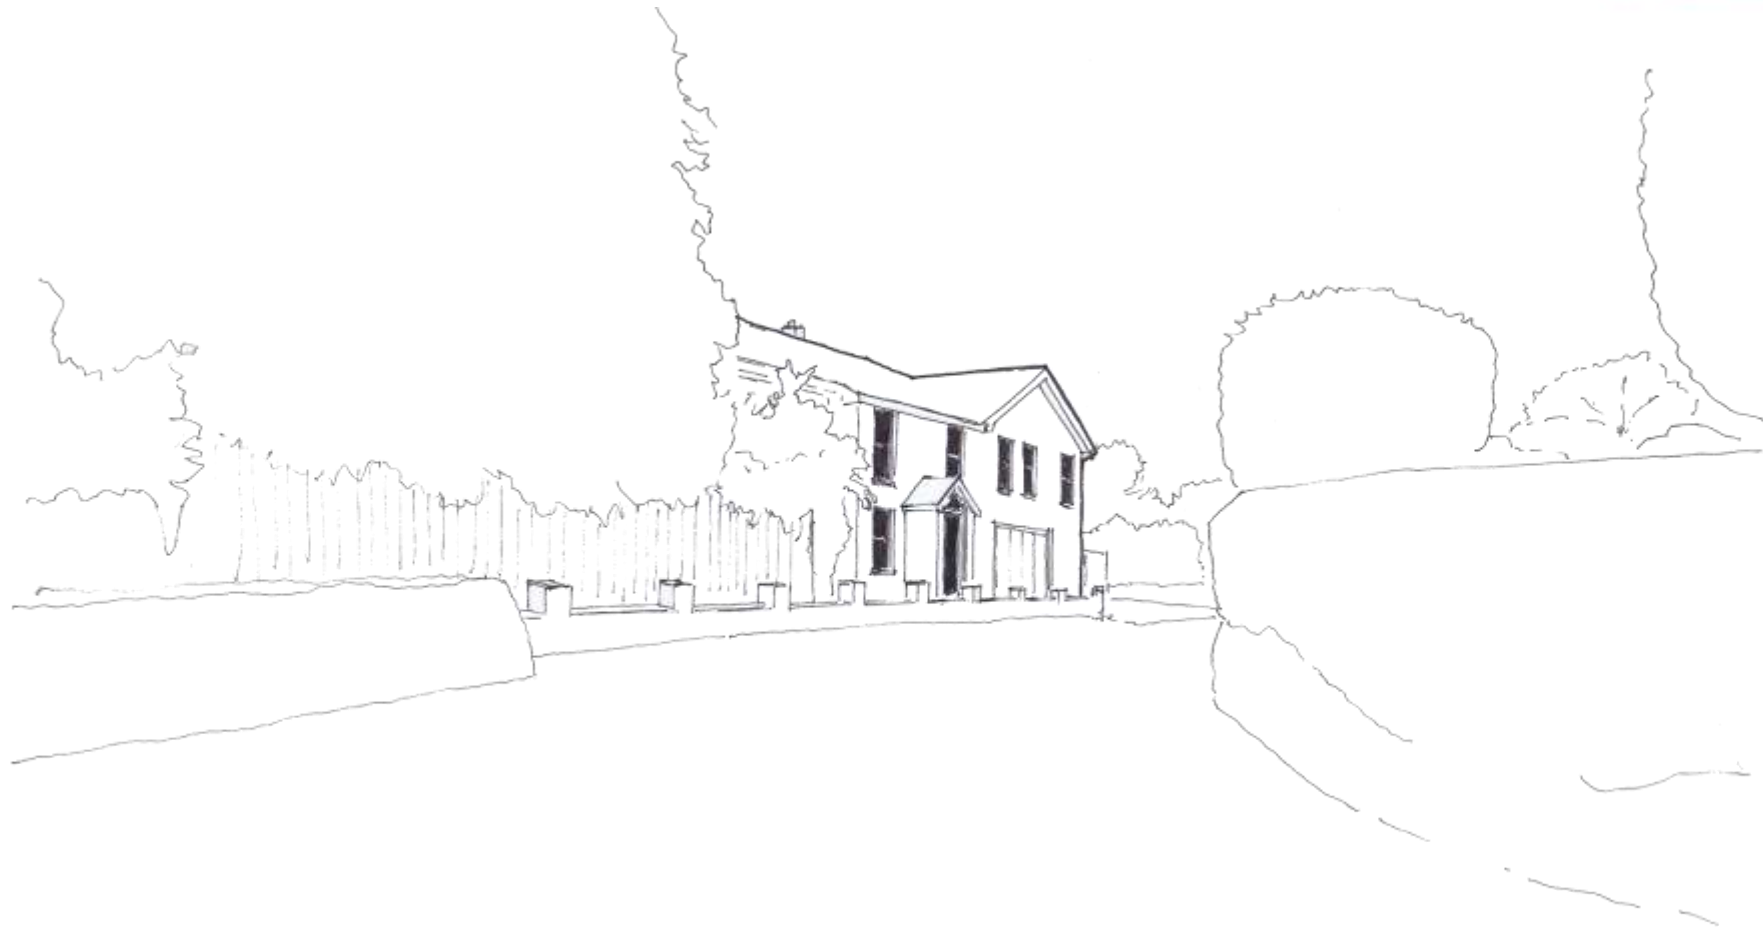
glancing view from public road toward Bridgehill (as proposed)
